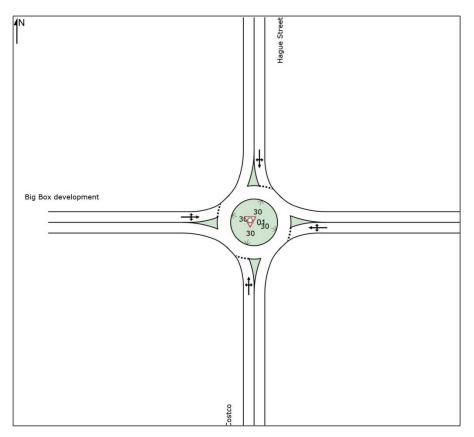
Proposed internal roundabout layout at southern end of Hague Street
